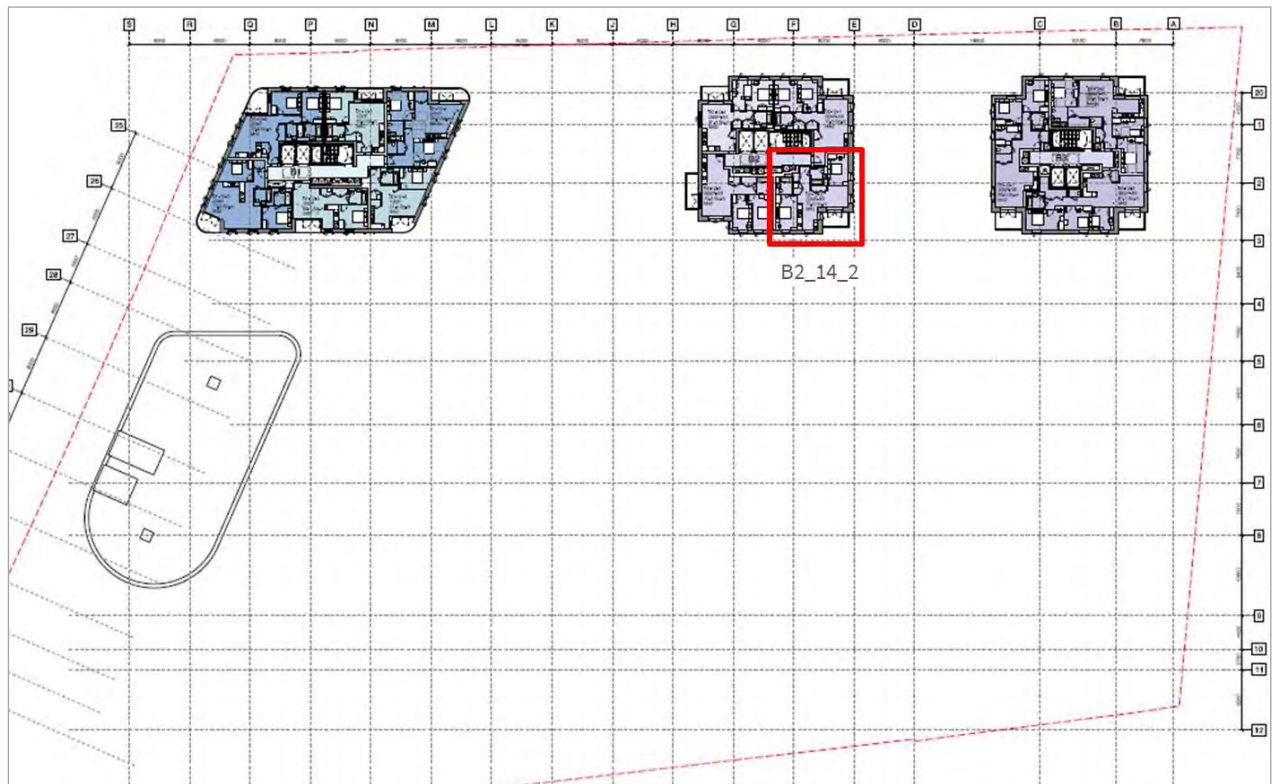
14th floor typical floor plan indicating two units tested (Source: Patel Taylor Architects received on 20.07.2020).
